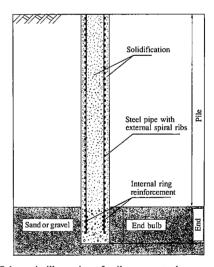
Schematic illustration of soil-cement-steel composite pile
